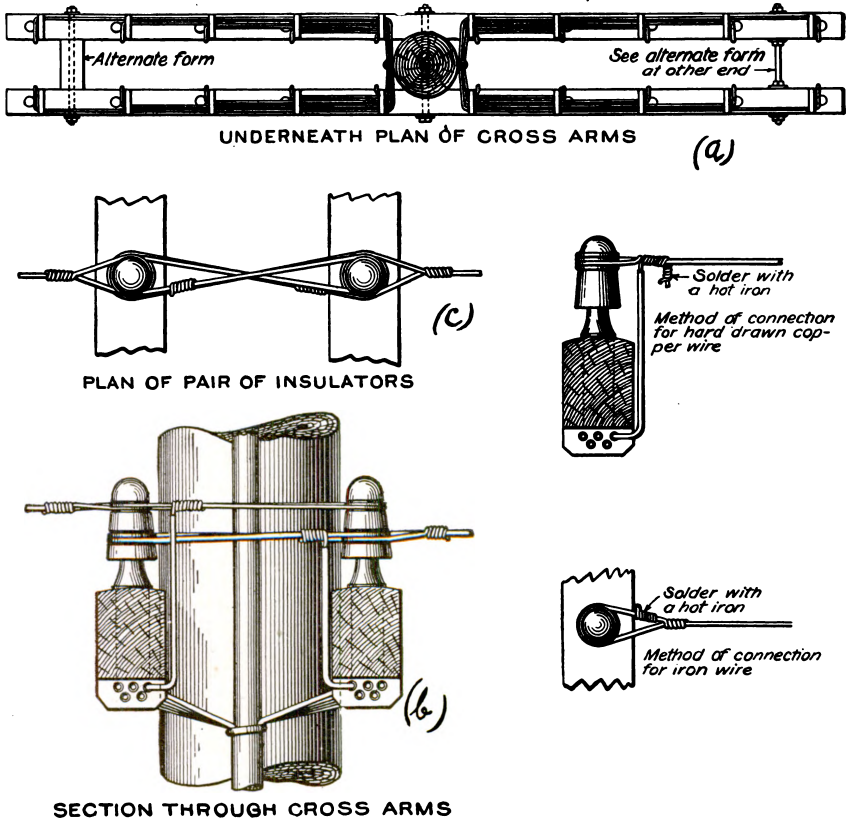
AERIAL LINE CONSTRUCTION, DOUBLE ARMING.
